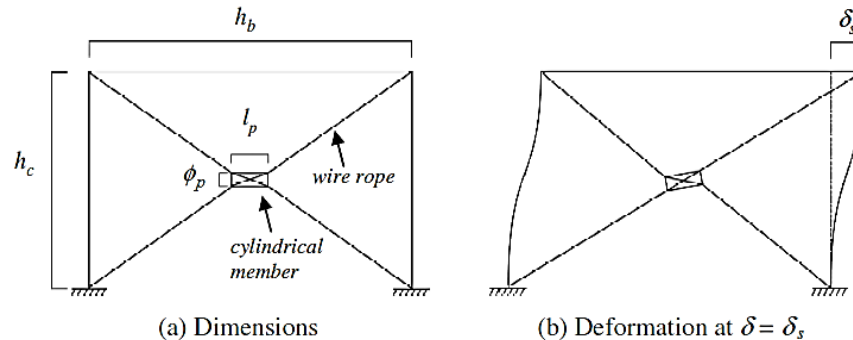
Cable-cylinder bracing system: a) dimensions; and b) deformed frame (Tagawa and Hou, 2007).
